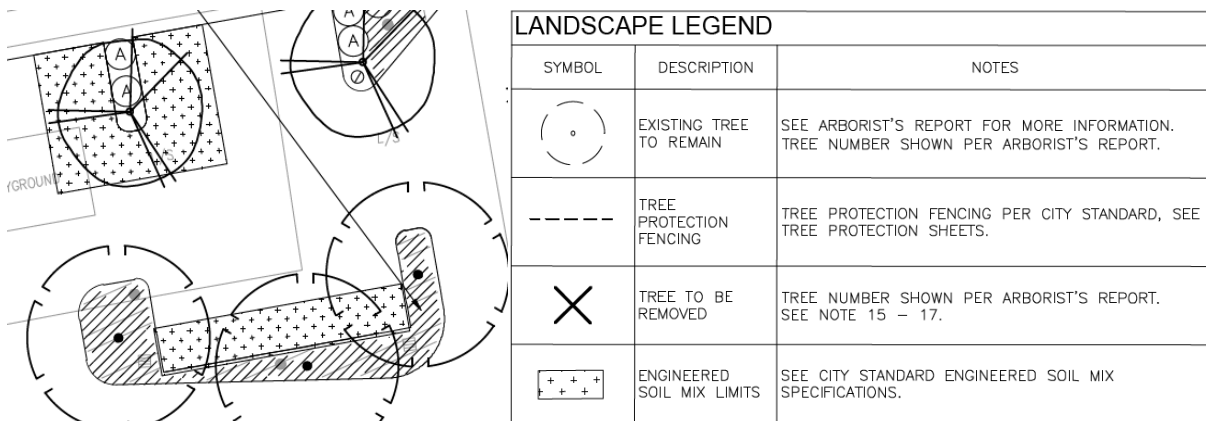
Architectural drawing of ESM under parking spaces adjacent to tree planters.
